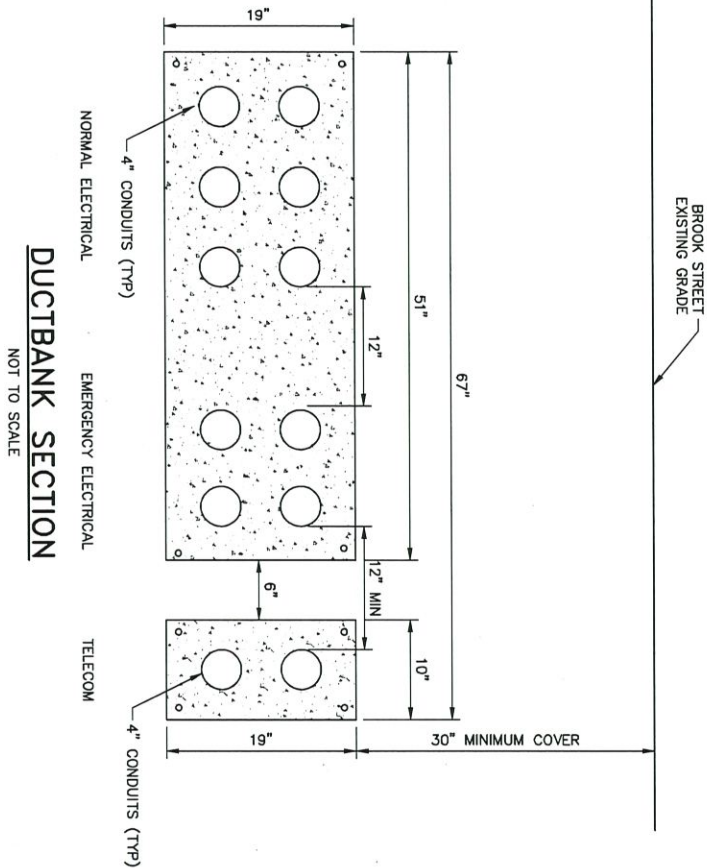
JOB NO: 0232979.00 DATE: 11/20/21 SCALE: NOT TO SCALE	BROWN UNIVERSITY DEPARTMENT OF FACILITIES MANAGEMENT PROVIDENCE, RI 02912	DUCTBANK SECTION		 33 Broad Street Floor 7 Providence, Rhode Island 02903 800.985.7857 www.woodardcurran.com COMMITMENT & INTEGRITY DRIVE RESULTS
